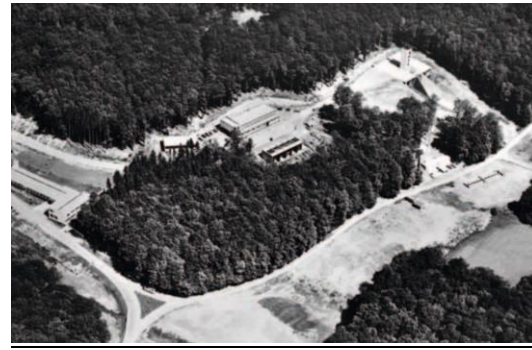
Images of Test Site Lampoldshausen during phase one construction works
